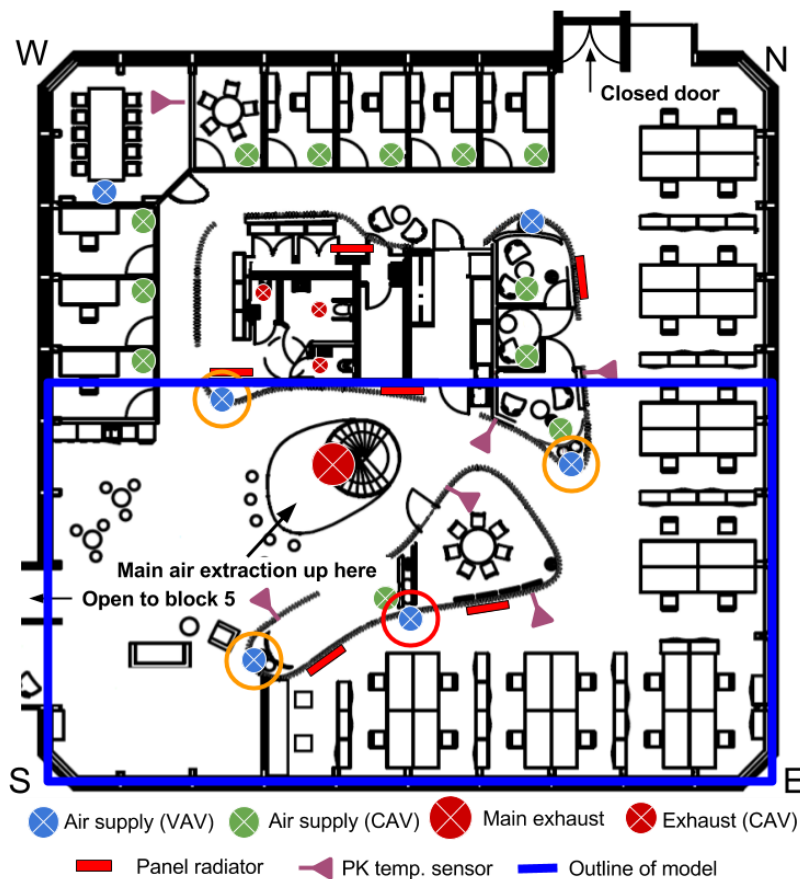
Floor plan of Powerhouse Kjørbo, 2<sup>nd</sup> floor in building 4, with outline of modelled part. Based on illustration by Søgne (2015b)
